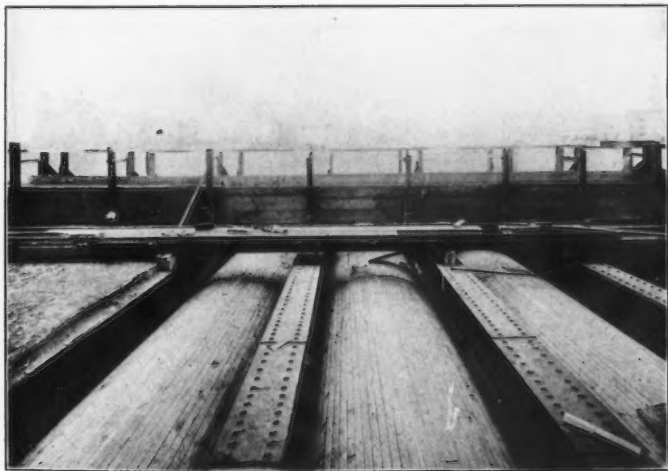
THIRTY-FIRST STREET BRIDGE FLOOR.
